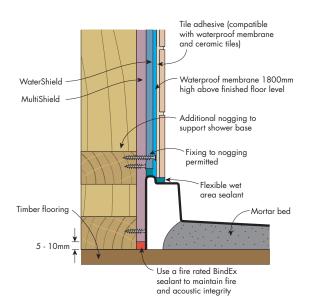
Wall Base in Shower Area Preformed external shower tray
